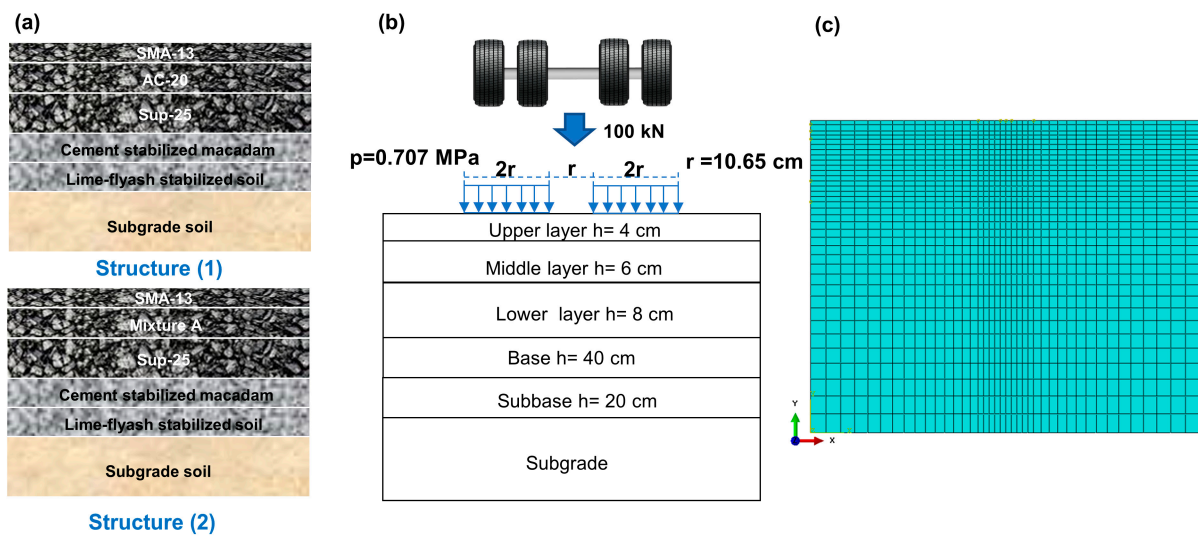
Pavement structural and finite element model. (a) Two pavement structures; (b) structure and load parameters; (c) finite element model mesh.
